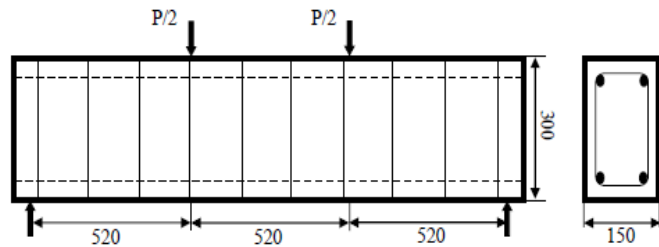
Geometry, reinforcement and load of the tested beams (Dimension in mm)
